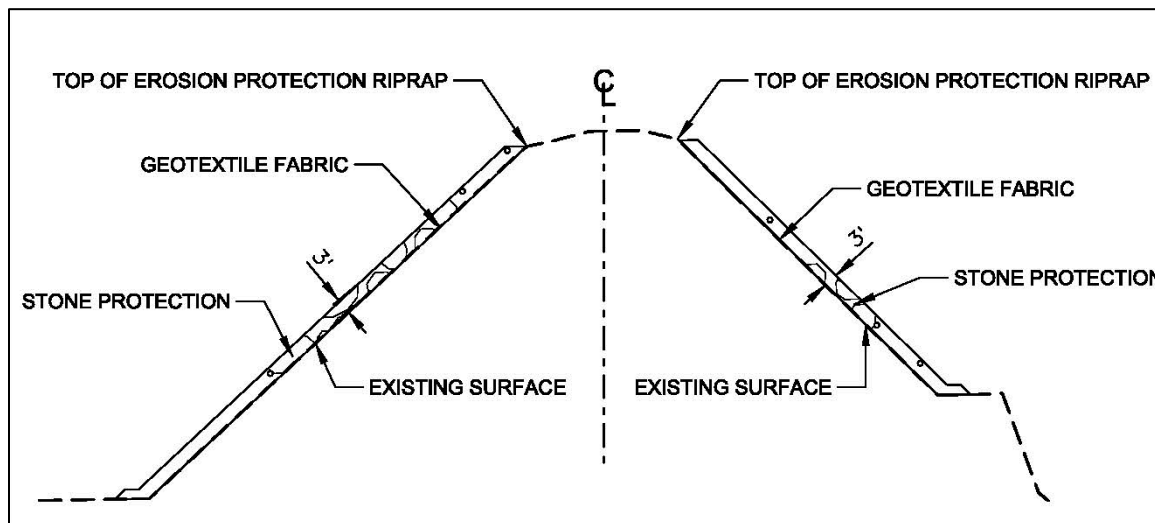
Bank Protection along Sacramento Bypass Training Levee.
